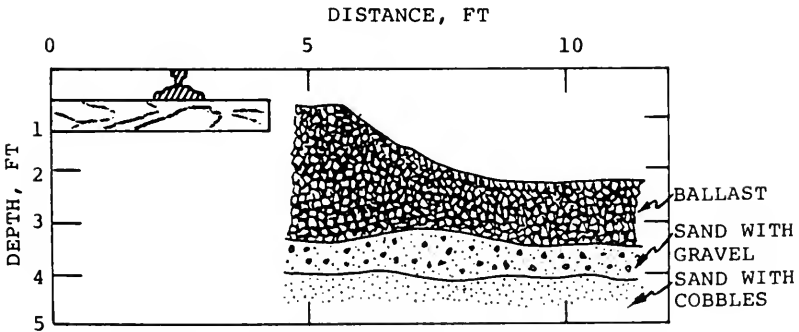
Transverse Cross Section at Site 3, Cross-Hole 1
